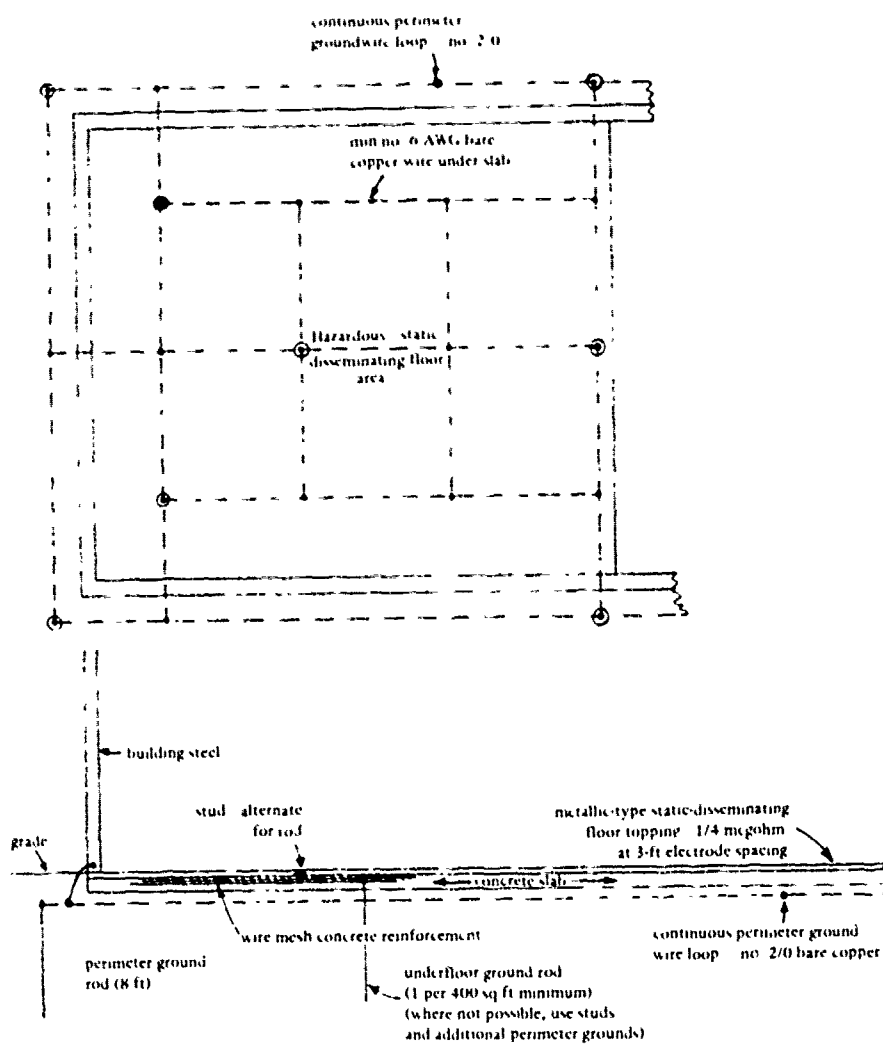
Conductive metallic topping floor and grounding plan at NAD, Crane, based on NAVFAC TS-9F15a.
